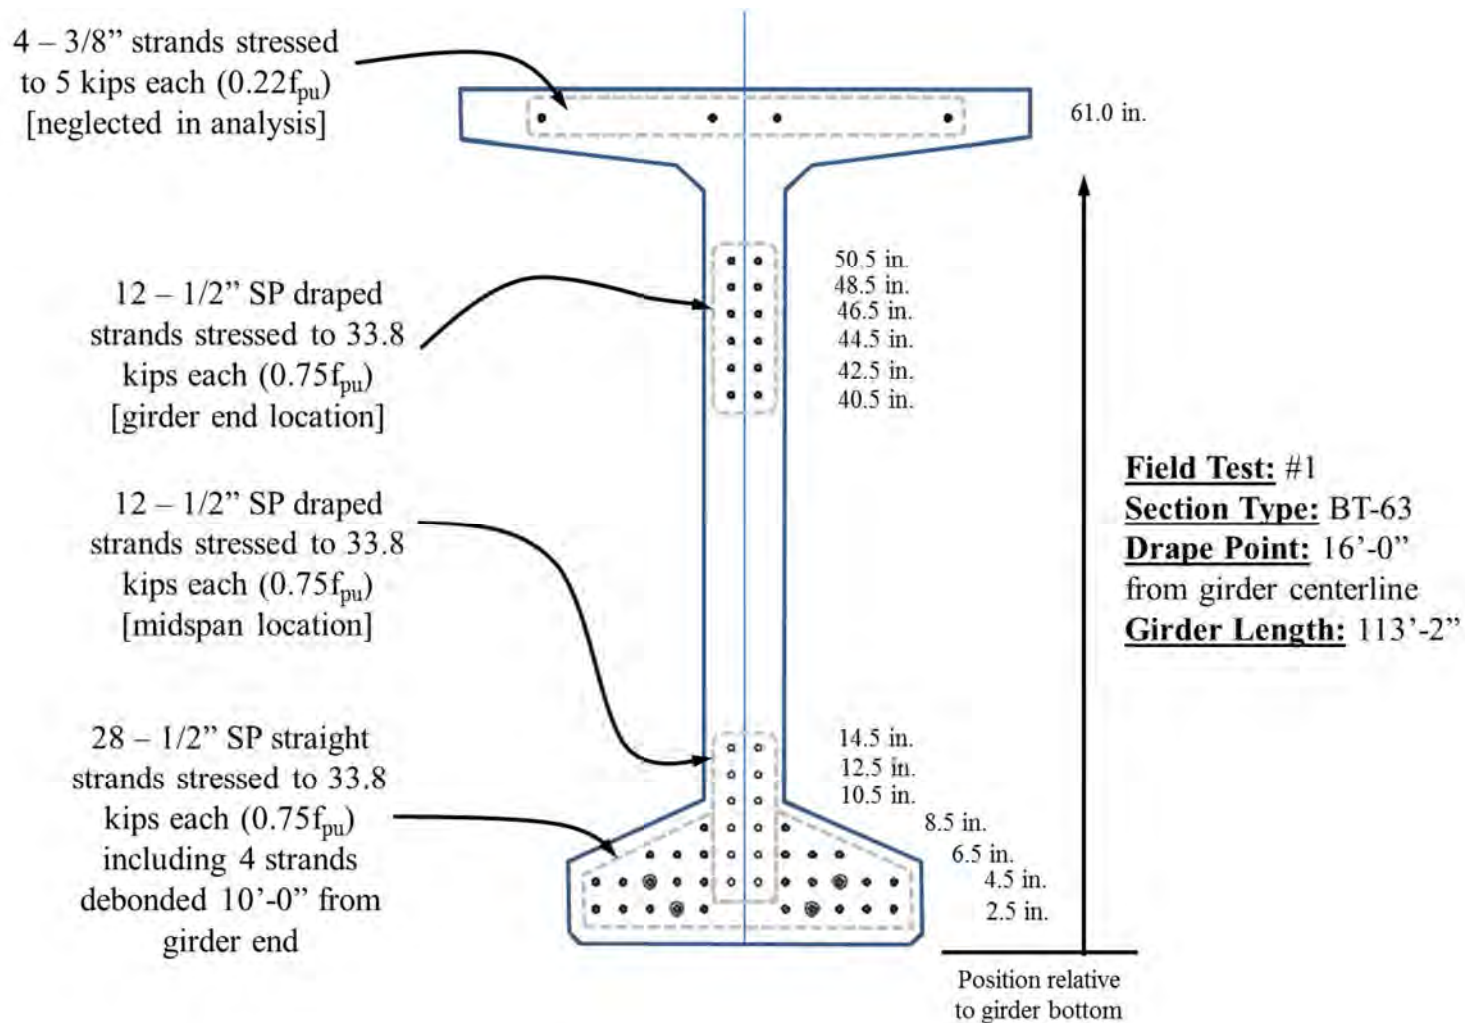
Girder and Prestressing Strand Details for Field Test #1
